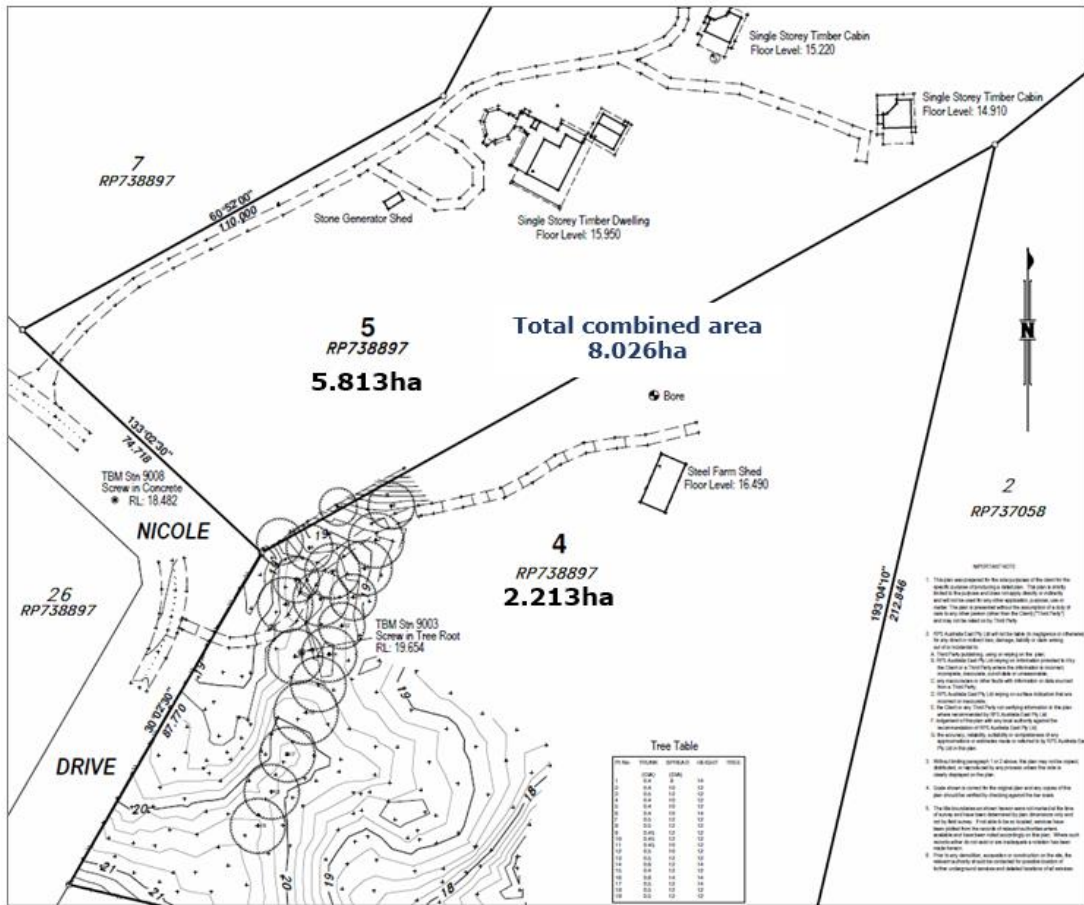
Site survey showing the existing dwelling, cabins (Lot 5) and farm building (Lot 4)
